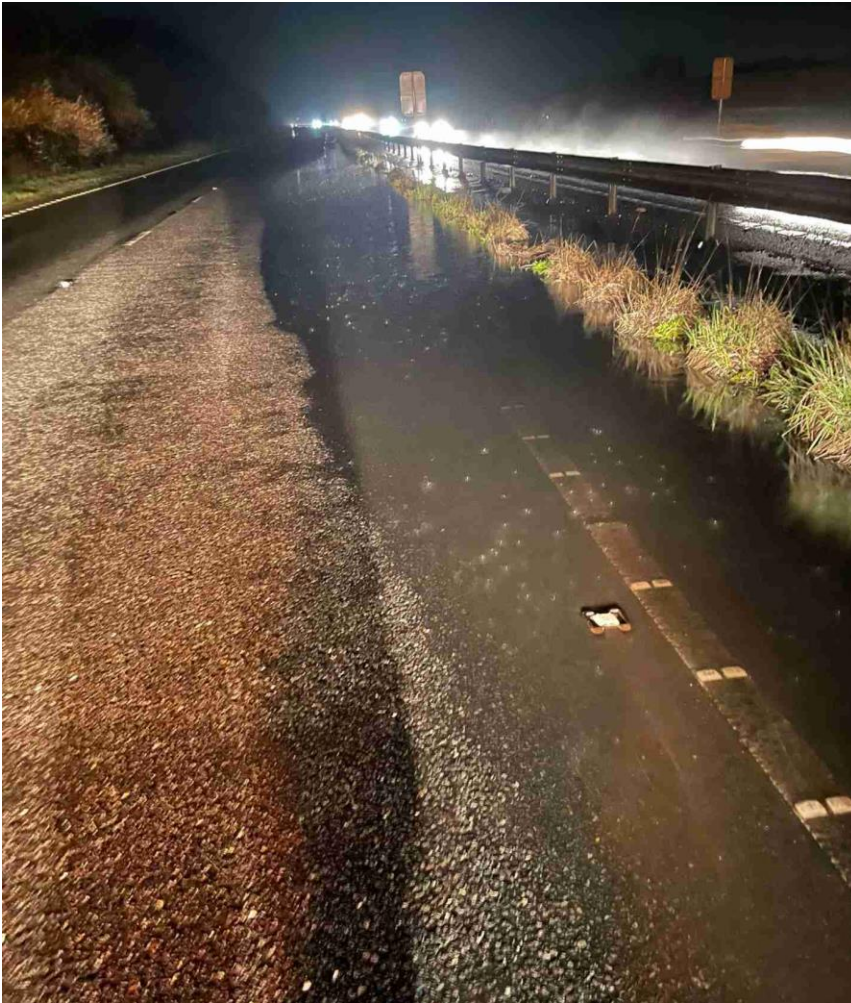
Flooding to carriageway on A27 Polegate Bypass (westbound) on 23 March 2023 (credit: National Highways)
